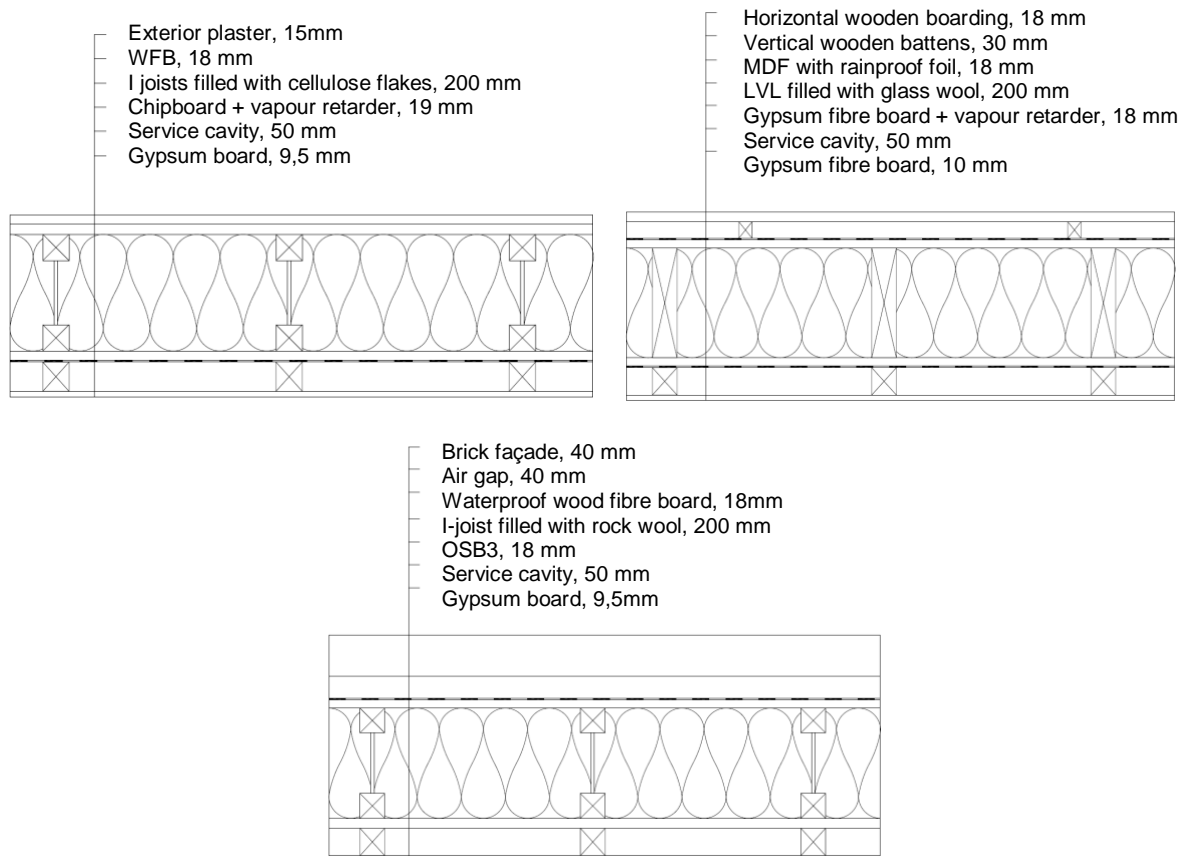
Low impact wall (upper left), high impact wall (upper right) and typical Belgian timber frame wall construction (below)
